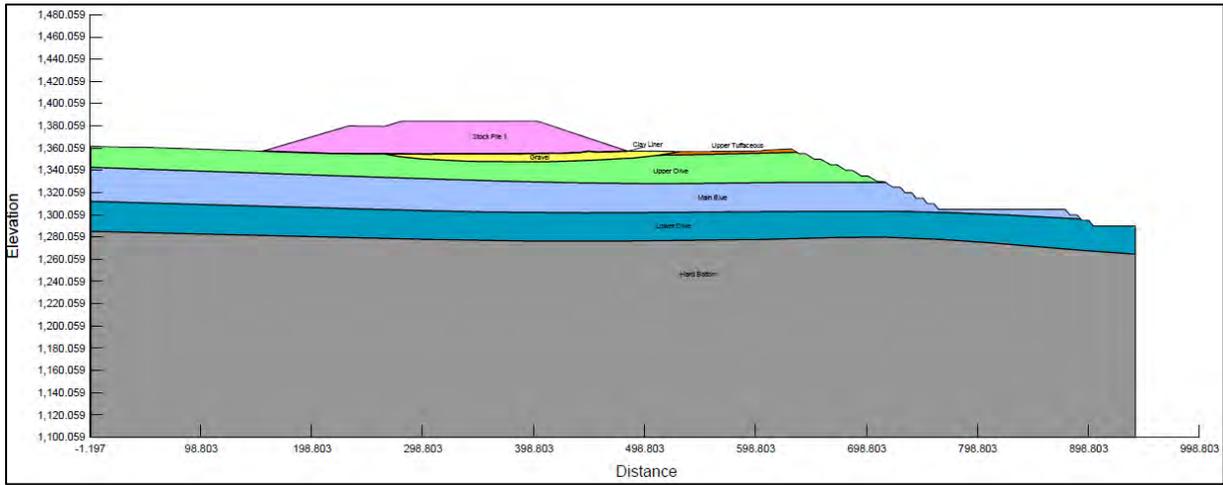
Low Grade Stockpile 1 Stability Cross-section (Source: GRE, 2023)
